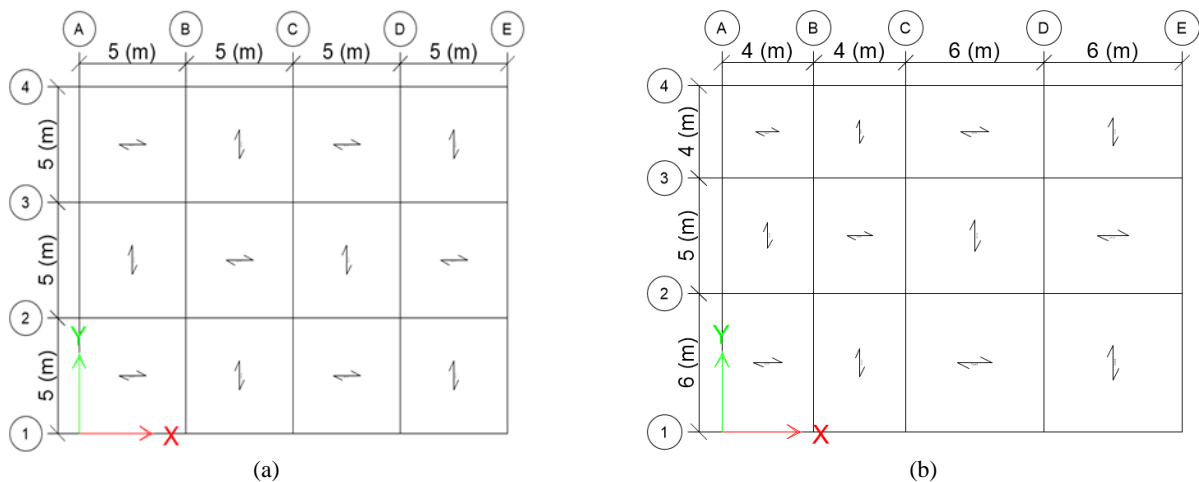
The plan of different types of modeled structures: (a) Structure with regular plan; (b) Structure with an Irregular plan
